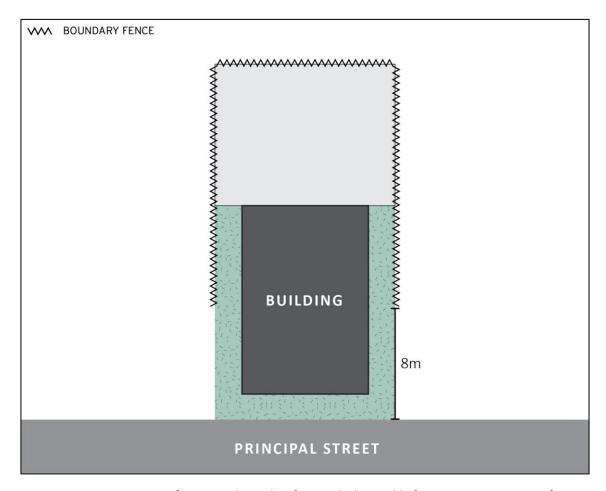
Construction of a new timber paling fence, which is visible from a street, is exempt if located in this area
